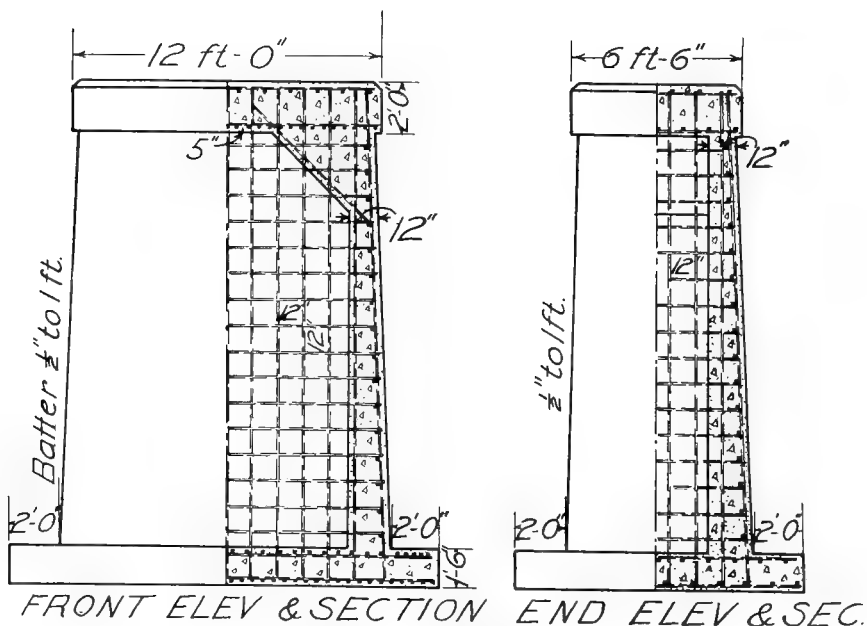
STANDARD REINFORCED CONCRETE PIER, K. C., M. & O. RY.
